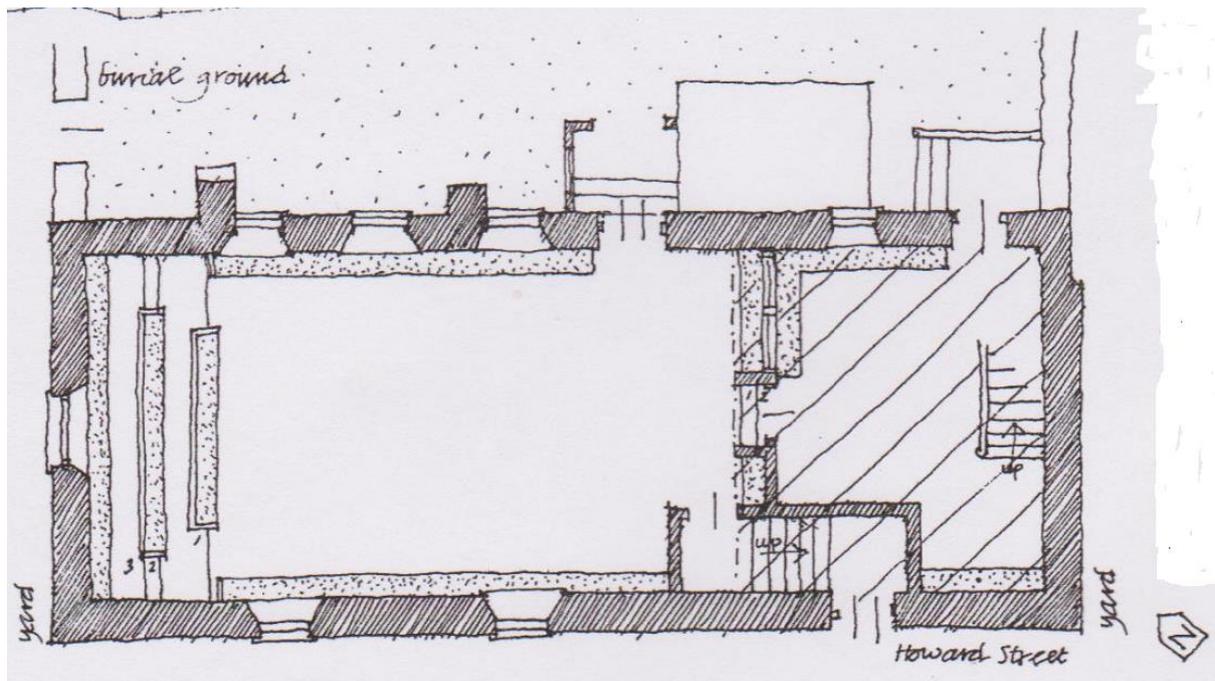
Ground Floor Plan of the meeting house in 1958 (Butler (1999) vol.1, p462)
